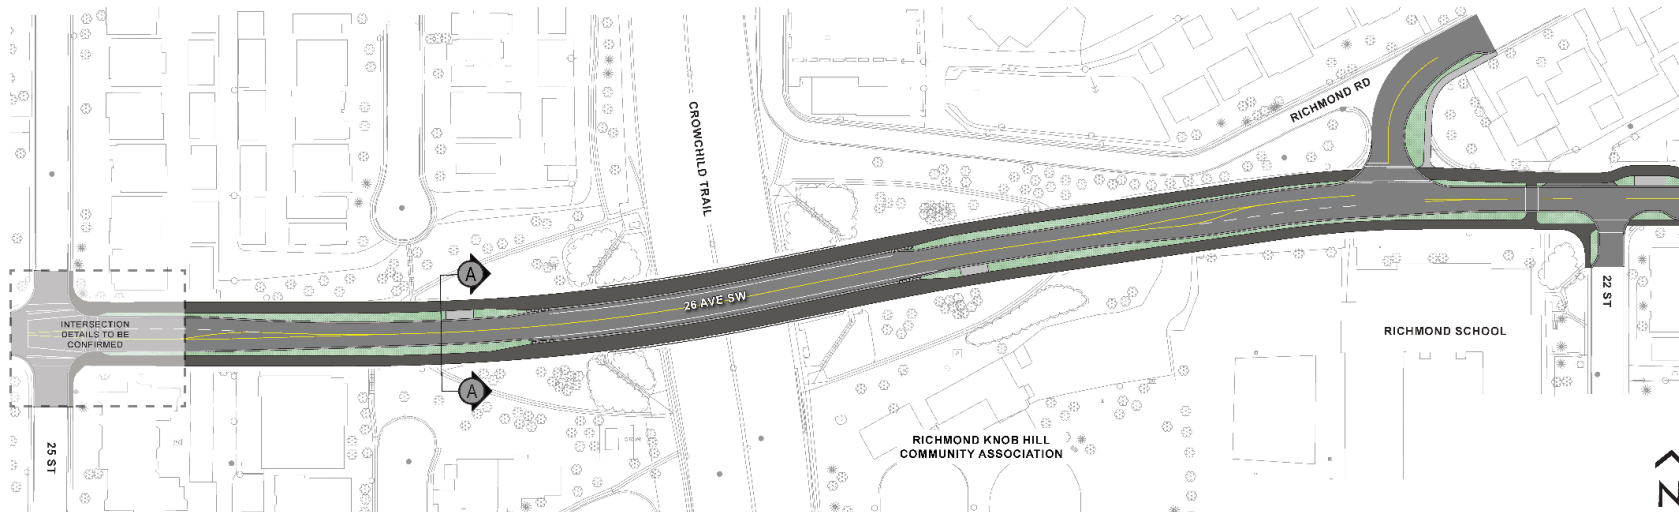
Option 3A (modified option 3 between 25 Street and Richmond Road with pathways on both sides of the bridge and crossings on both intersections)
